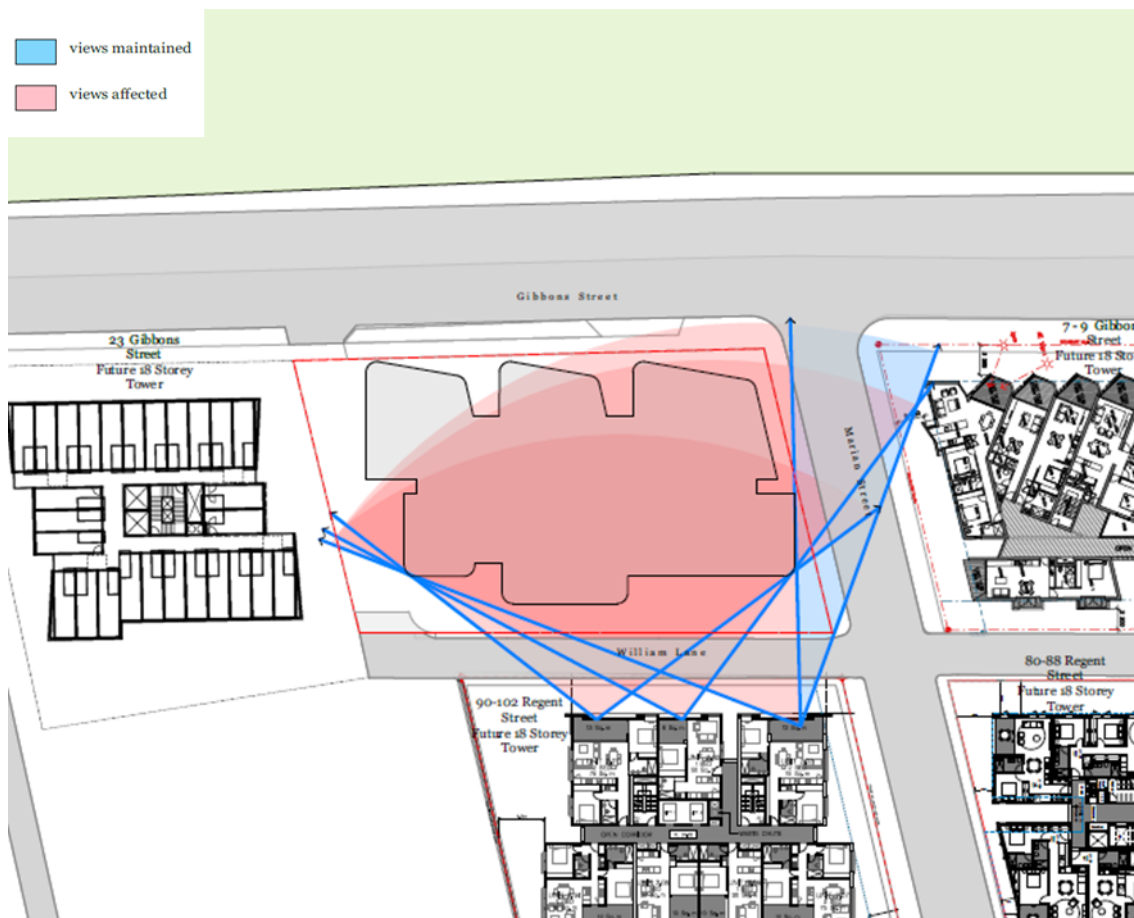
Views likely to be affected and maintained for 90-102 Regent street (Source: DKO)
